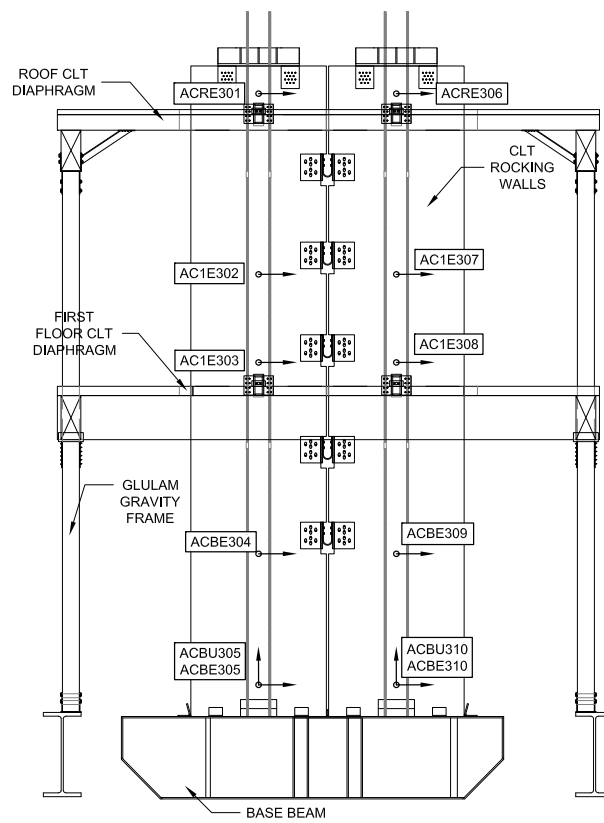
Typical location of accelerometers installed on the rocking walls
